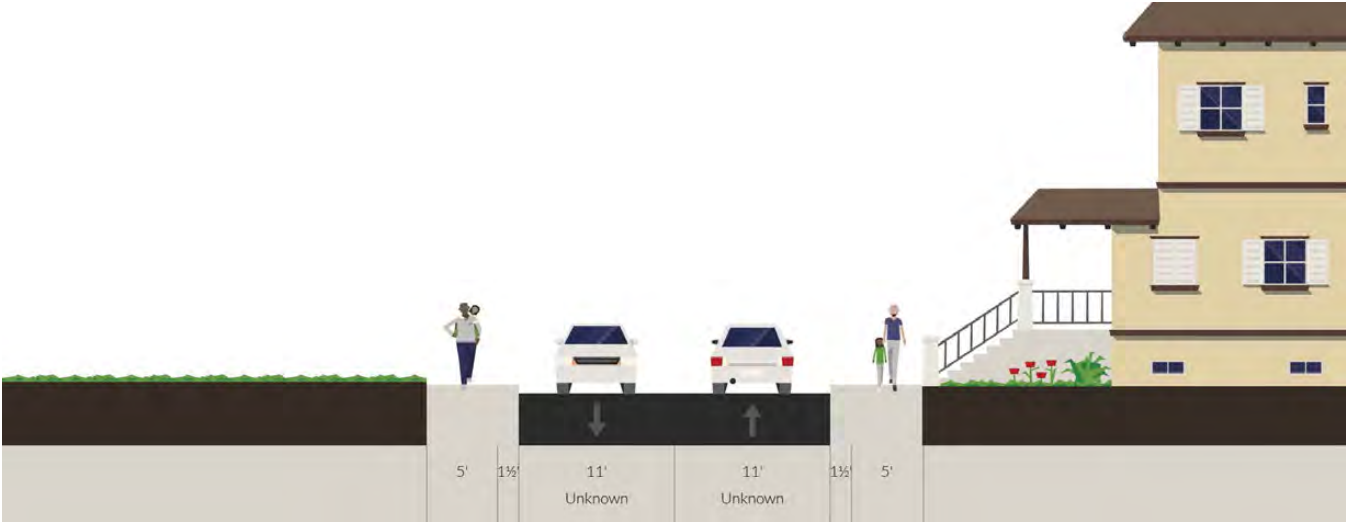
Cross Section: Georgia St. - Booker Dr. to Caldwell Park (Downtown Boundary)
